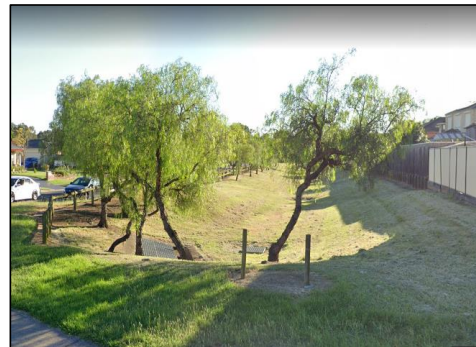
photos of open space over low flow pipes in Horningsea Park
